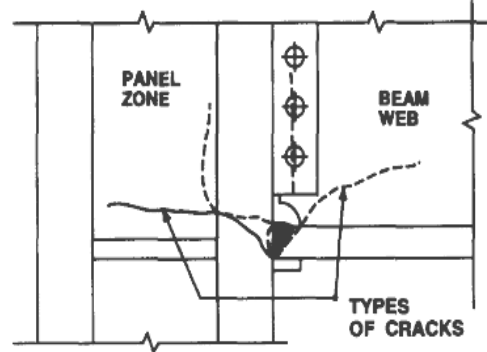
Some failure modes of the welded beam-to-column connection [3]
